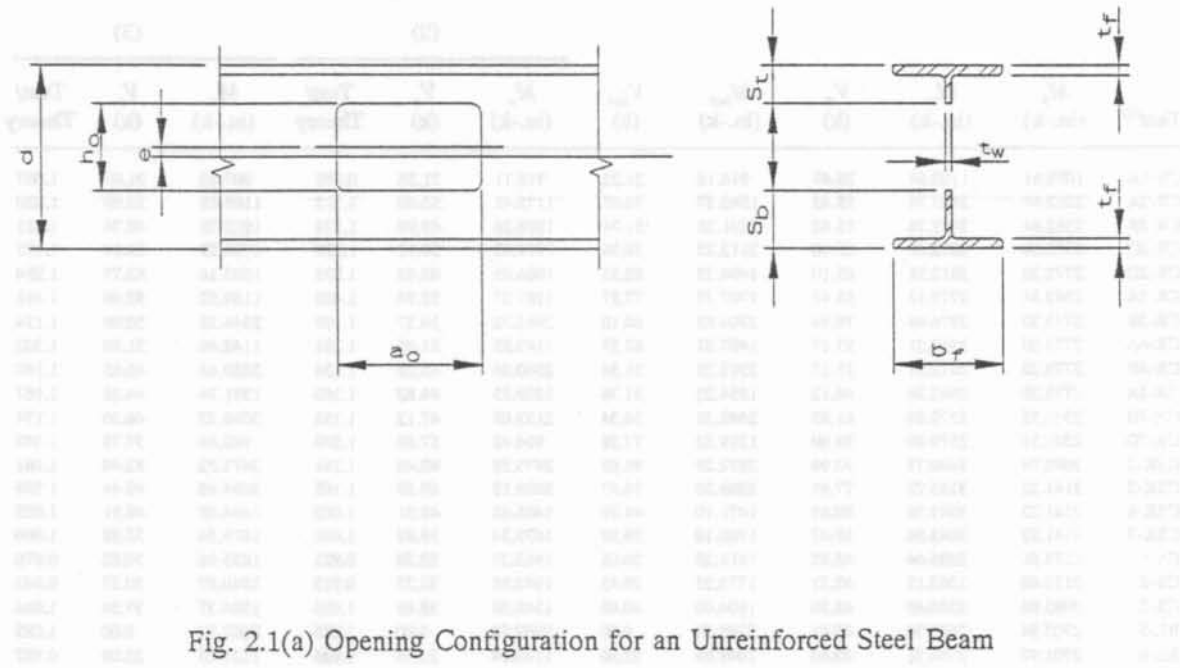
(a) Opening Configuration for an Unreinforced Steel Beam
